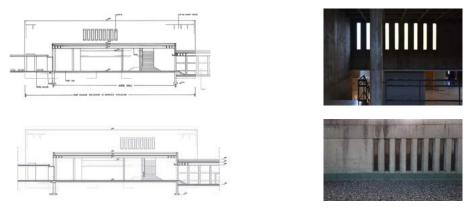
The changing position of the windows on the north façade of the F Block, the interior and exterior view of the current condition
